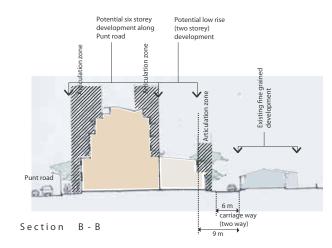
Punt Road Frontage Sub-Precinct Building Envelopes
